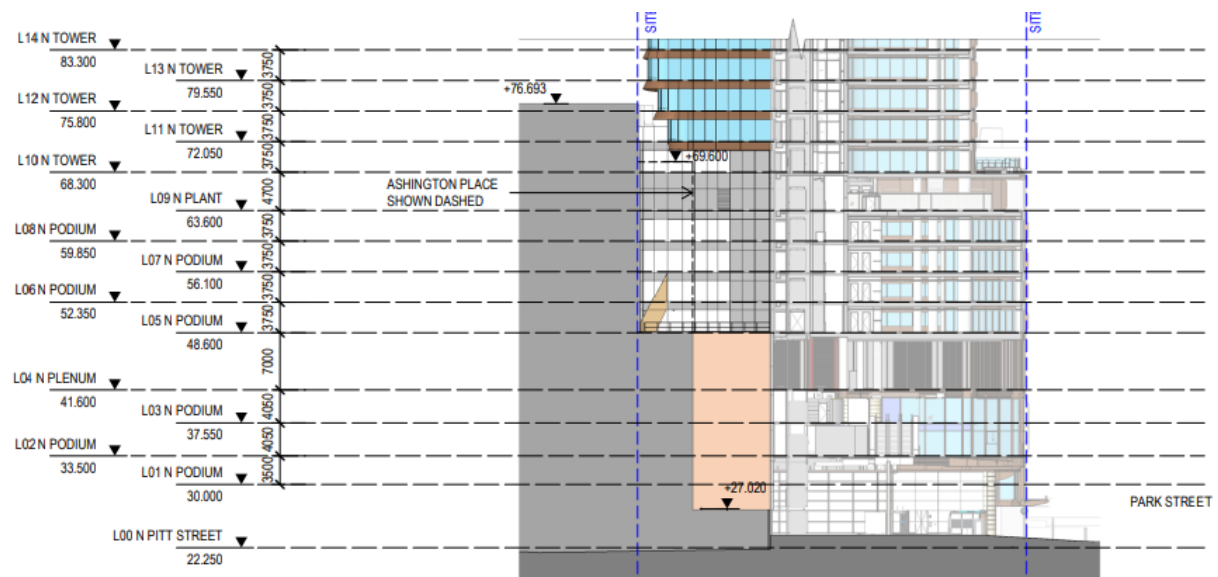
Approved General Arrangement Elevation West Elevation – Pitt Street (with missing north-south façade identified in red)
